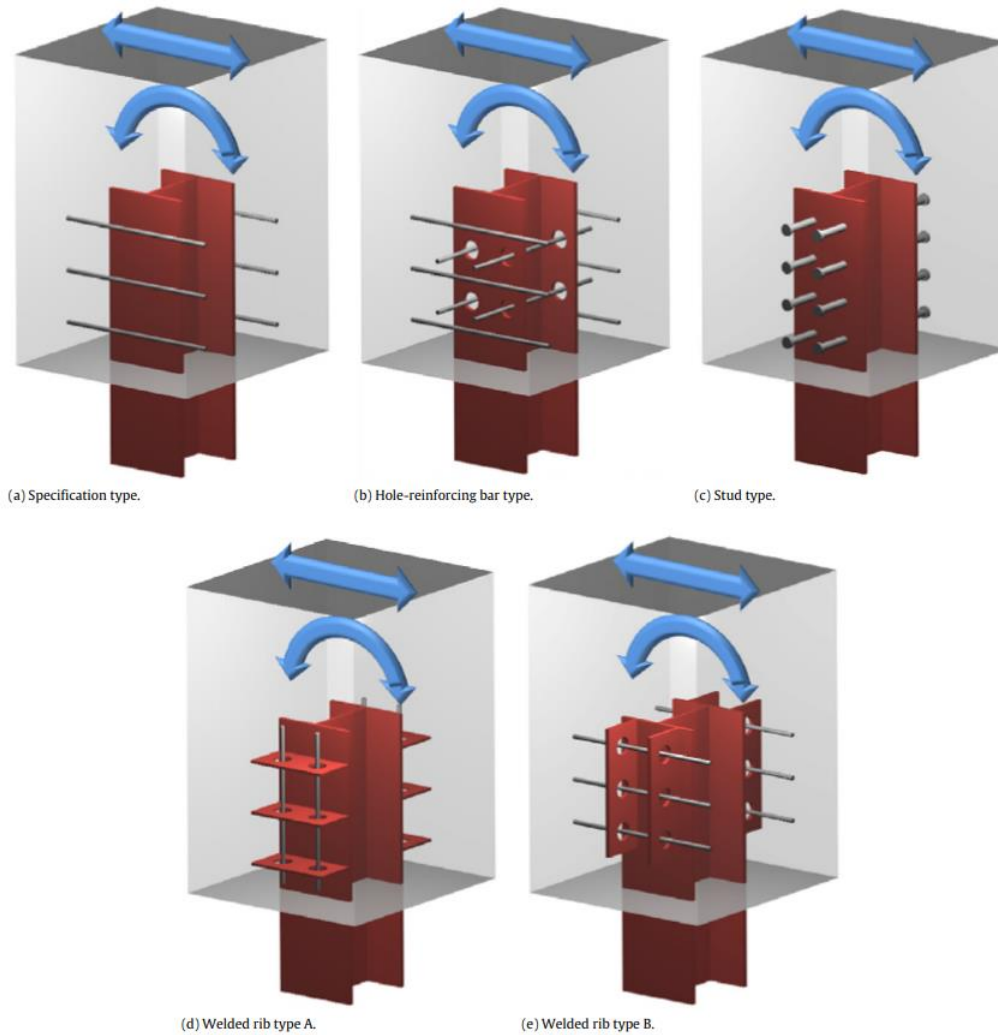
Proposed abutment-pile connections.* (Ahn, Yoon, Kim, & Kim, 2011)
